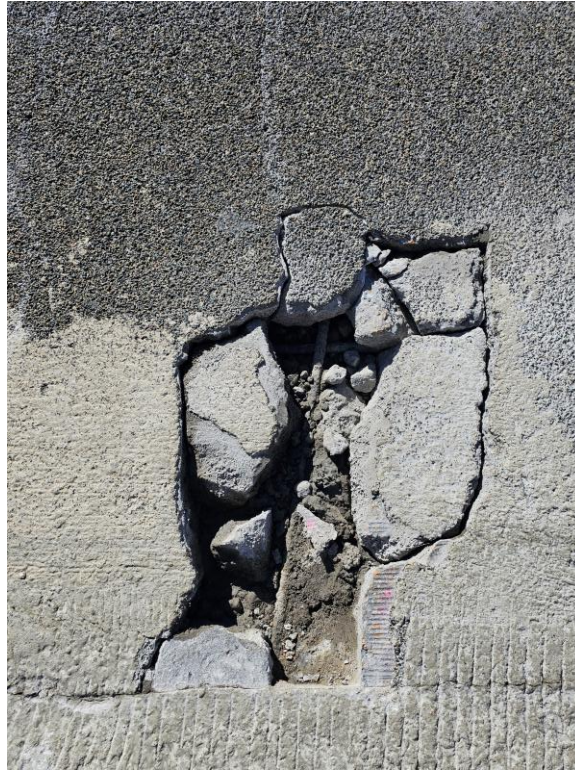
Localized structural failure of lightweight concrete bridge deck.
